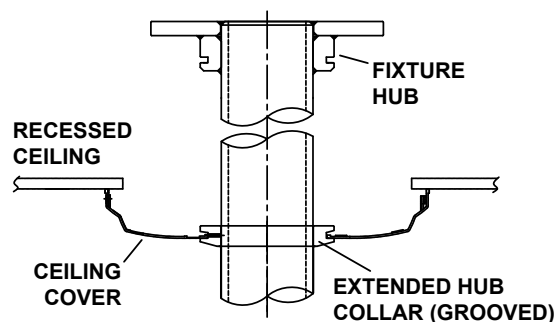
AUT\_H Ceiling Cover Installation (Recessed Ceiling)
